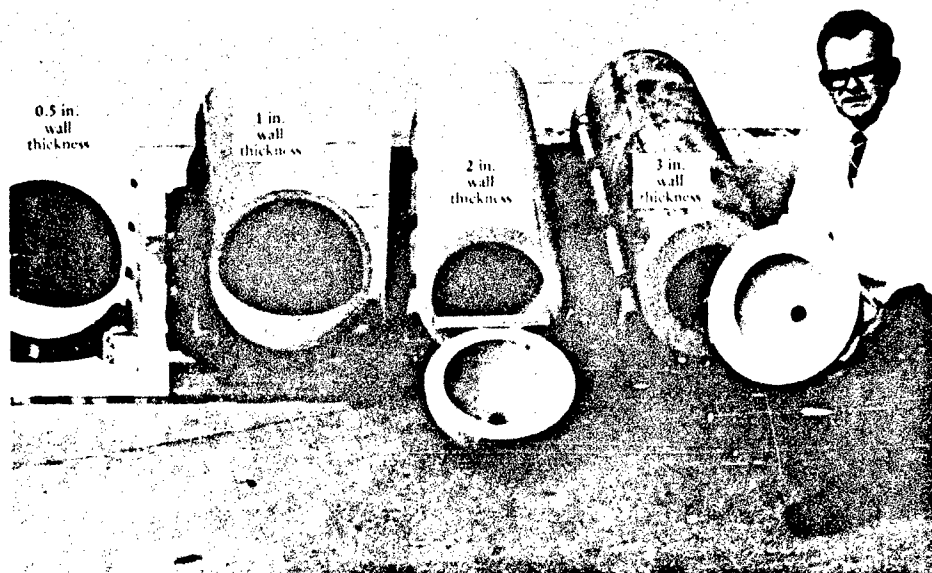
16-inch OD concrete test cylinders with various wall thicknesses were tested under hydrostatic loads to implosion.
